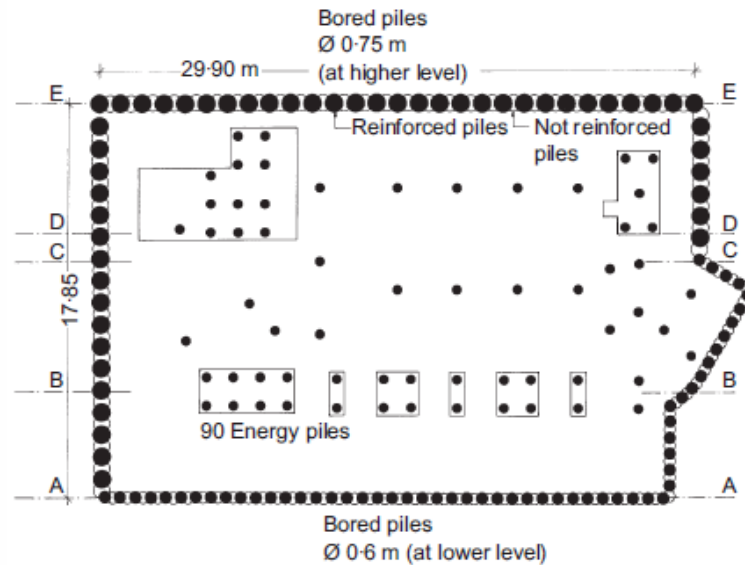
Energy Piles for foundation and pit retaining wall at Keble College, Oxford
